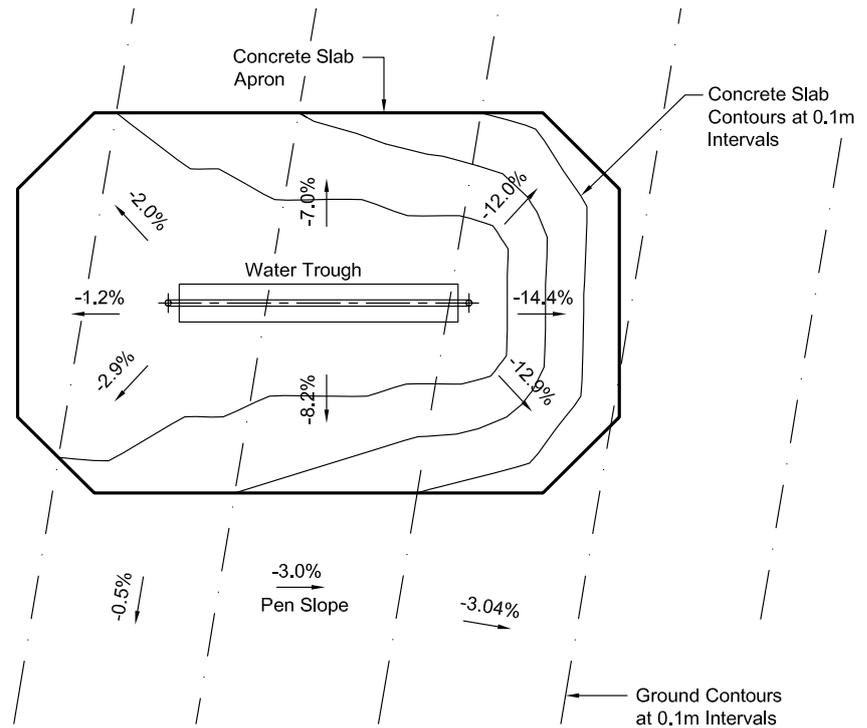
Typical concrete apron plan view with apron graded down at 1% on upslope side
